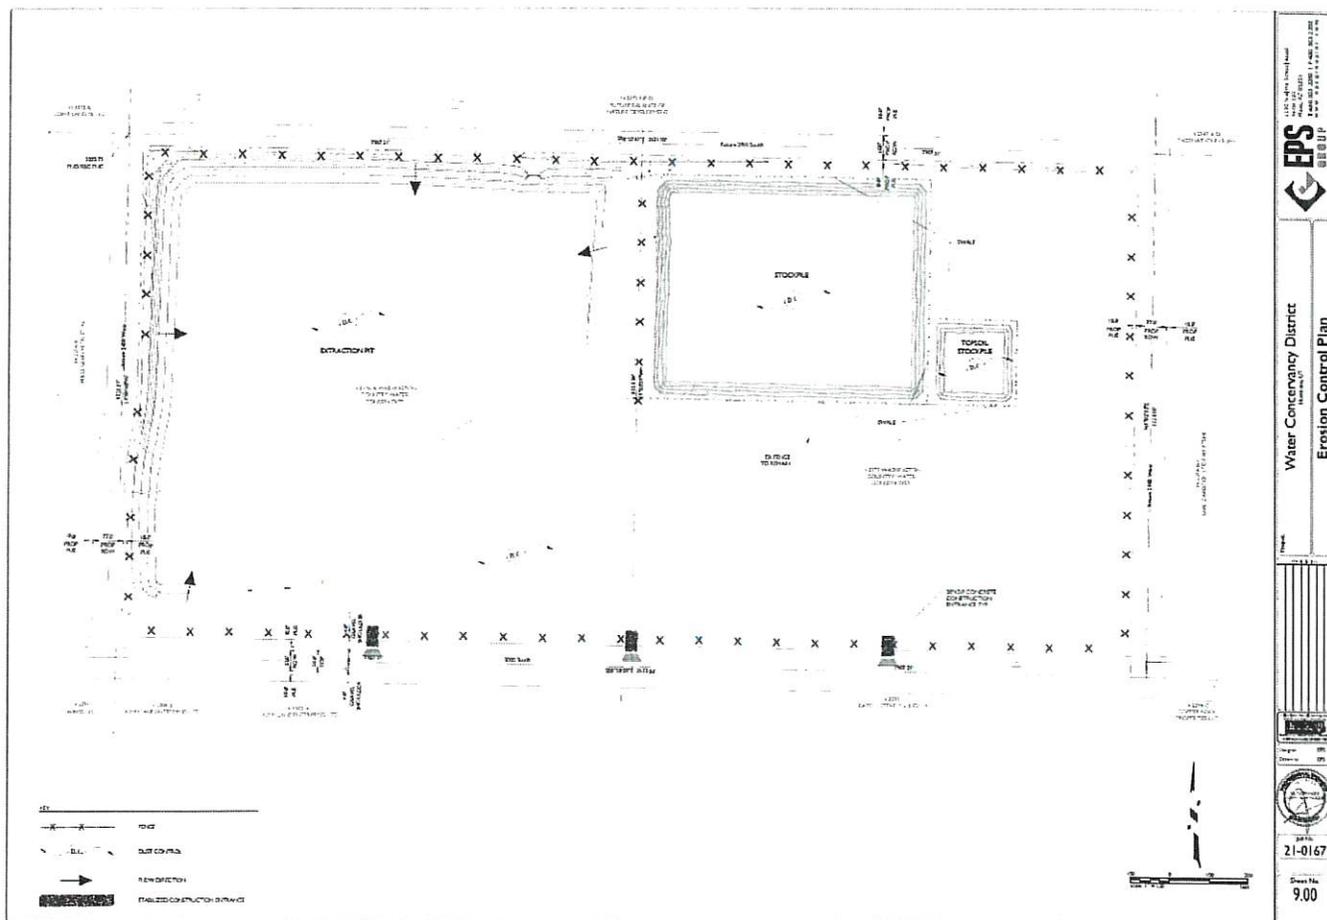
Sheet 9 (Erosion Control Plan)
